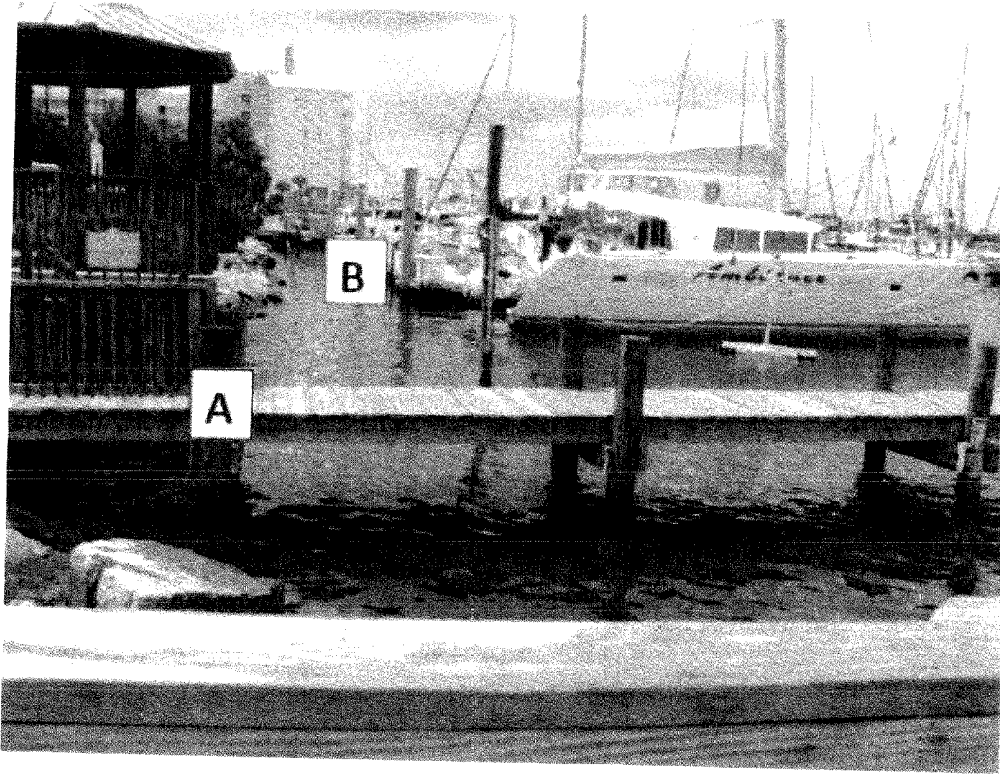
Oak Shore Drive location for new pier and improvements to the Earl Gilbert Boat Dock and Access.
